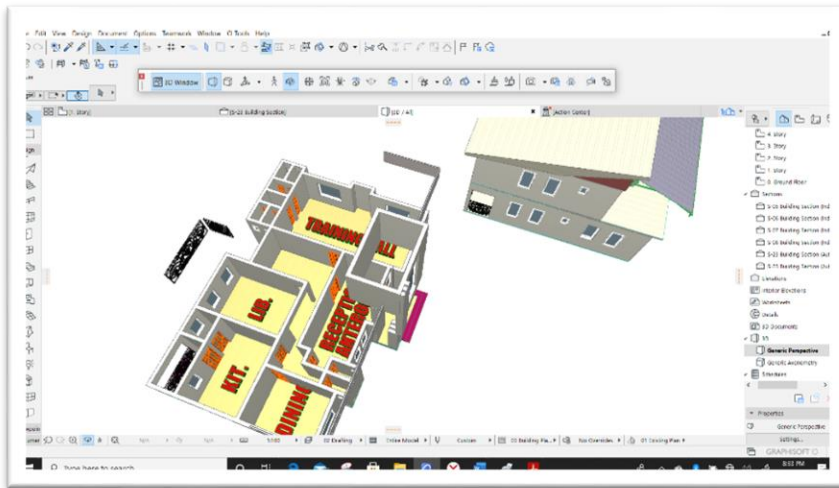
Design 3D de-construction showing the various spaces at the first-floor level.
